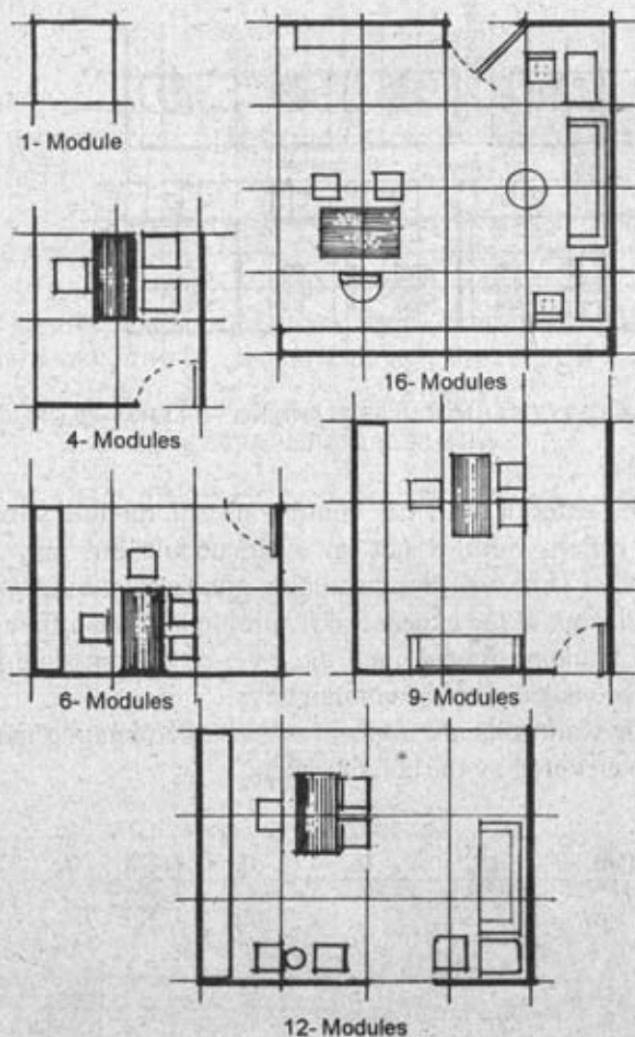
TYPICAL OFFICE MODULAR PLANNING
